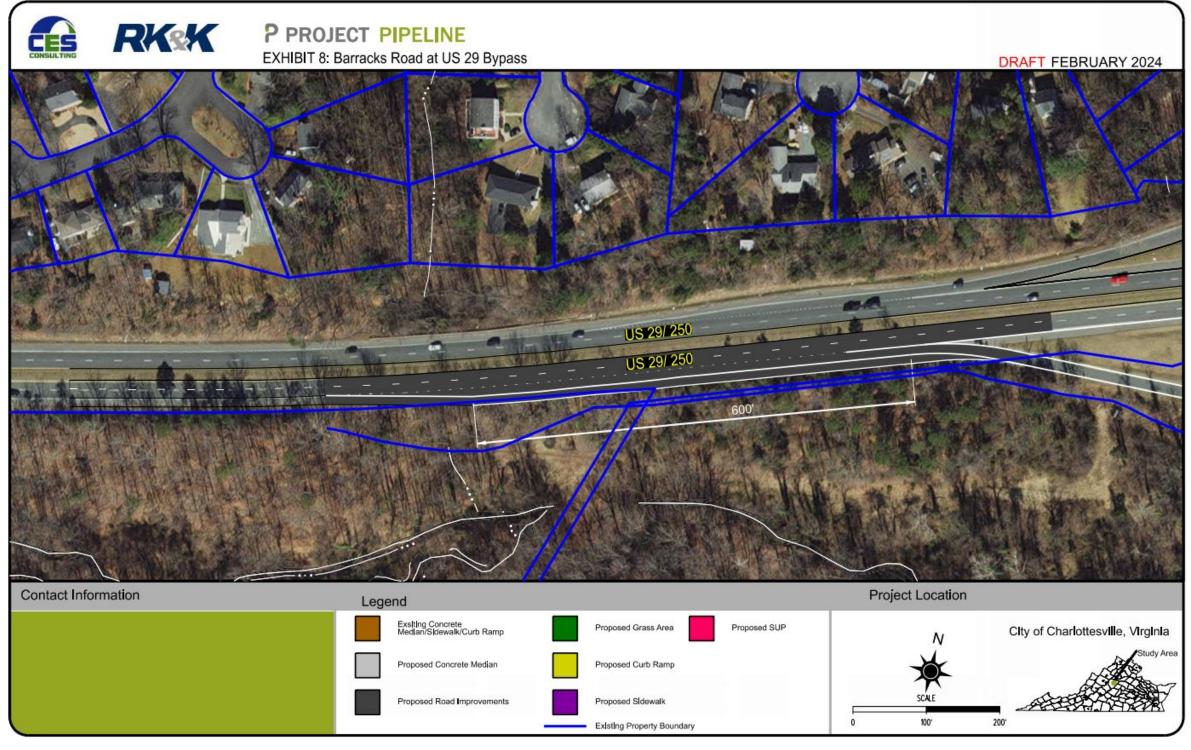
Barracks Road (Route 654) – Layout for Concept 8
